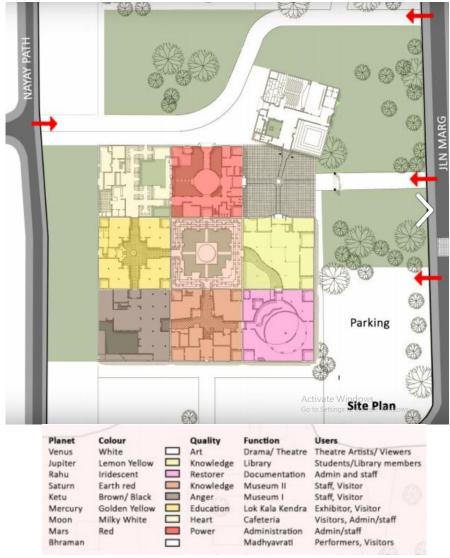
MASTER PLAN OF KALA KENDRA (SOURCE: ISSUU)
